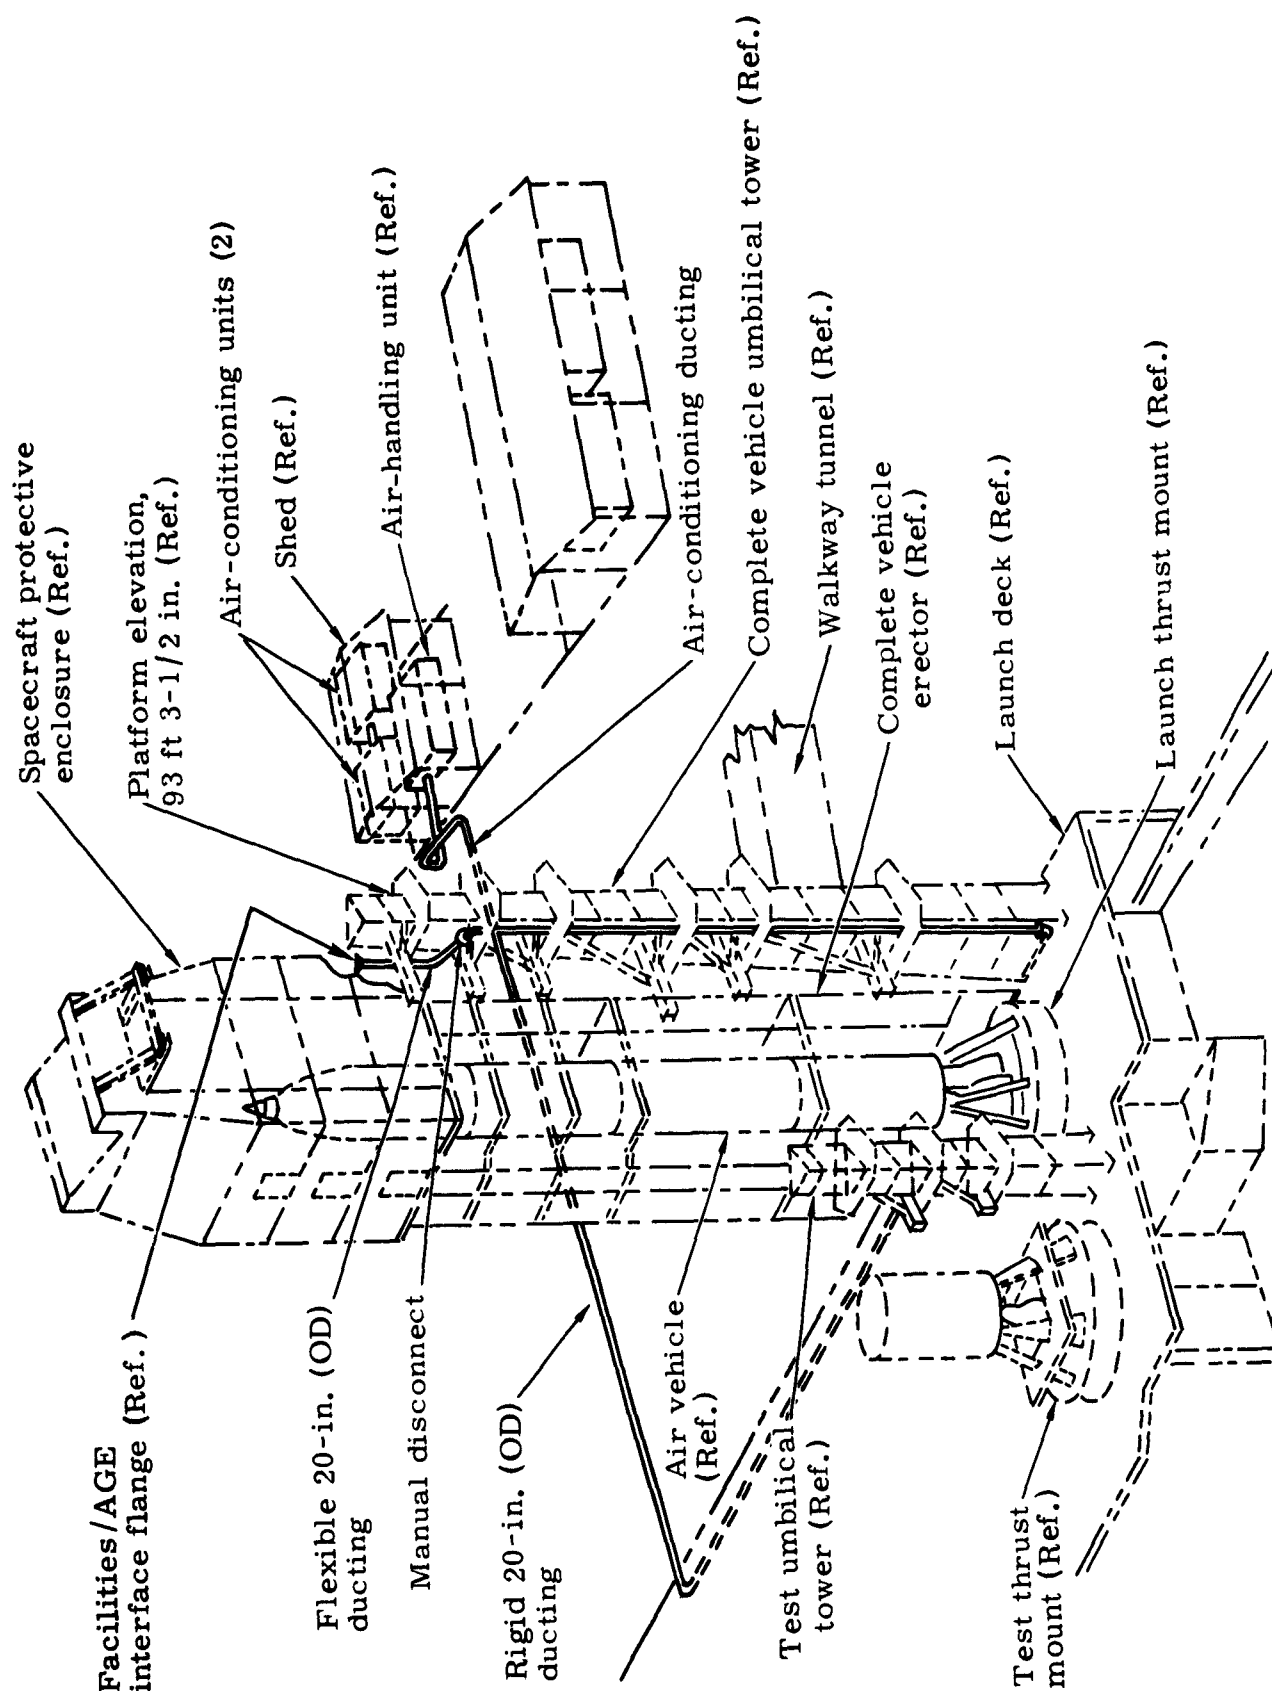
Spacecraft Protective Enclosure Air-Conditioning Ducting
